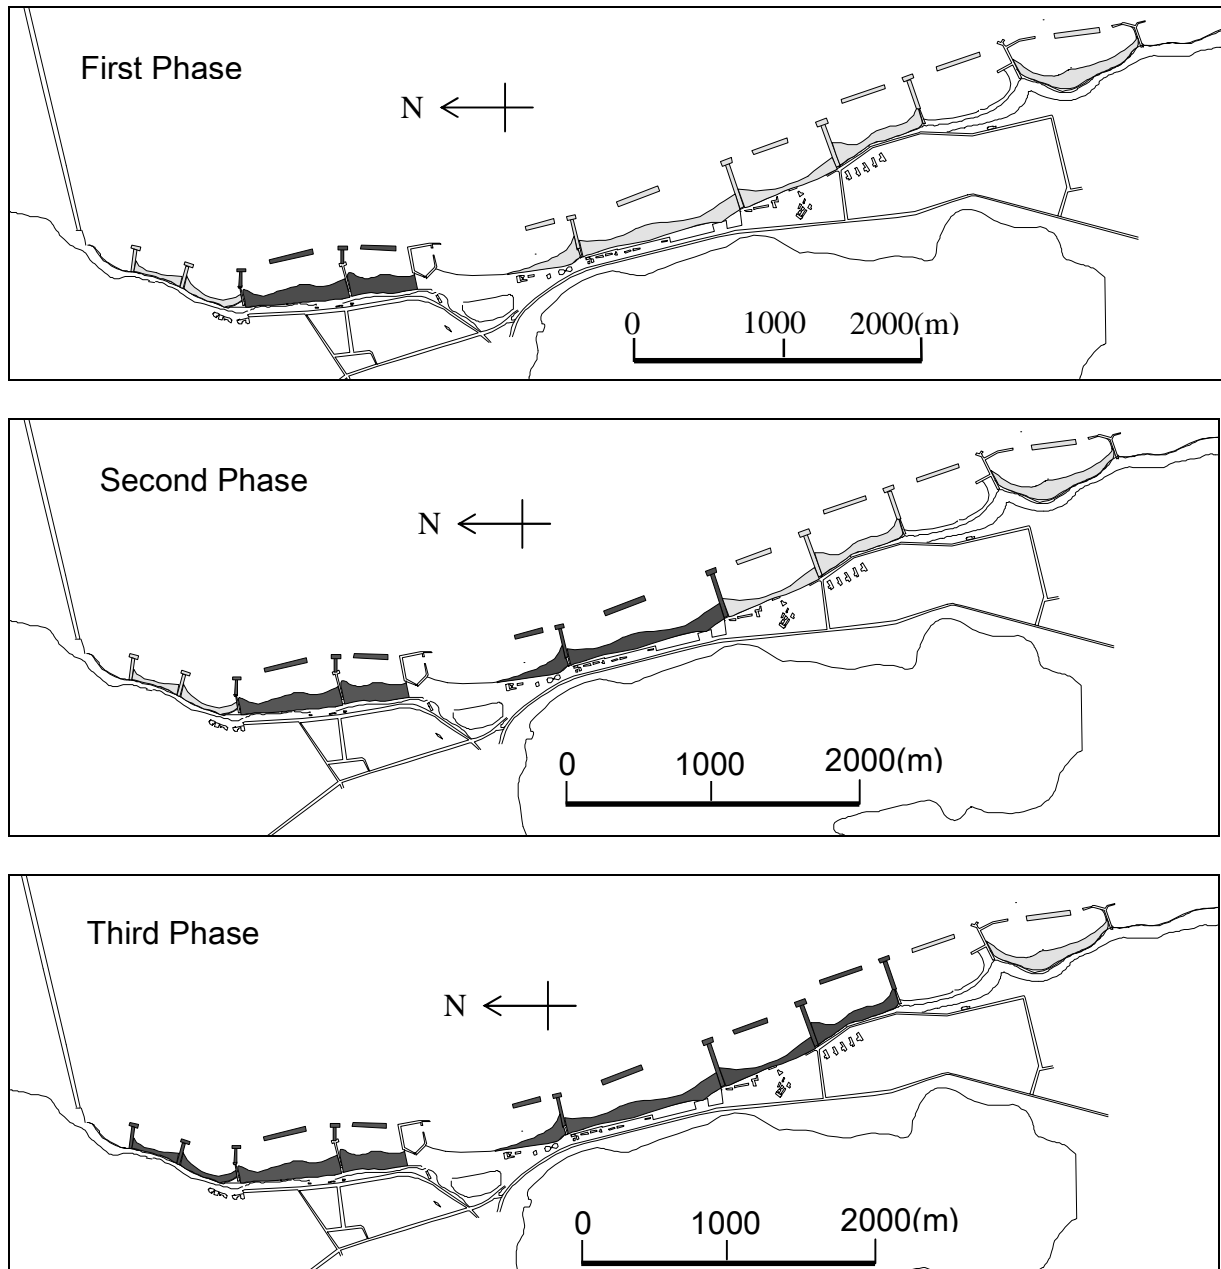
Phase-wise plans for facility installation in Eforie Sector
